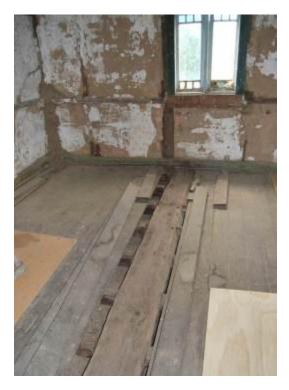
Interior view of the first floor, showing the original timber beaded skirting and chair rail and evidence of limewash finish. The timber floorboards and joists are supported on timber beams which bear onto the brickwork. Note the original opening fitted with a later window (see Figures 2.3 and 2.6).
